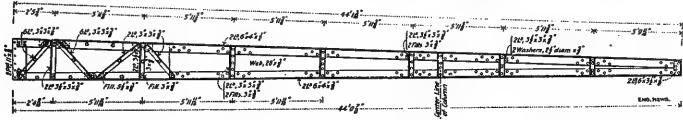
TRUSS SUPPORTING GLASS CANOPY OVER TRAIN CONCOURSE.
